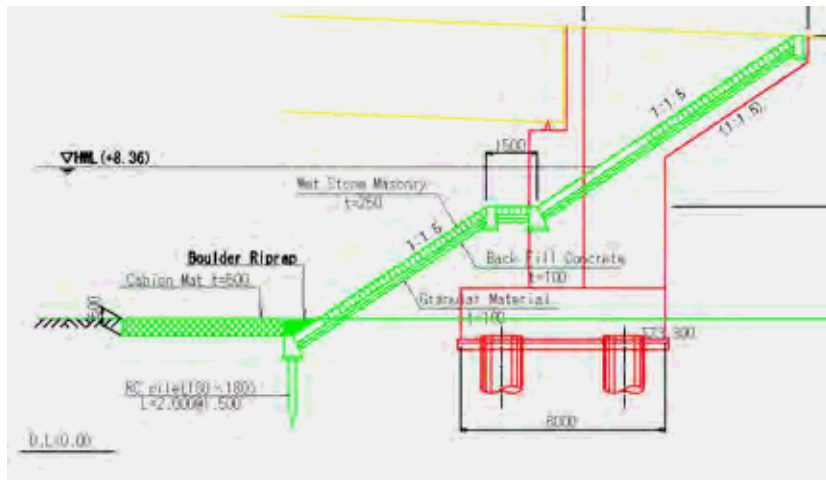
Structure of Wet Masonry Revetment with Pile Foundation
